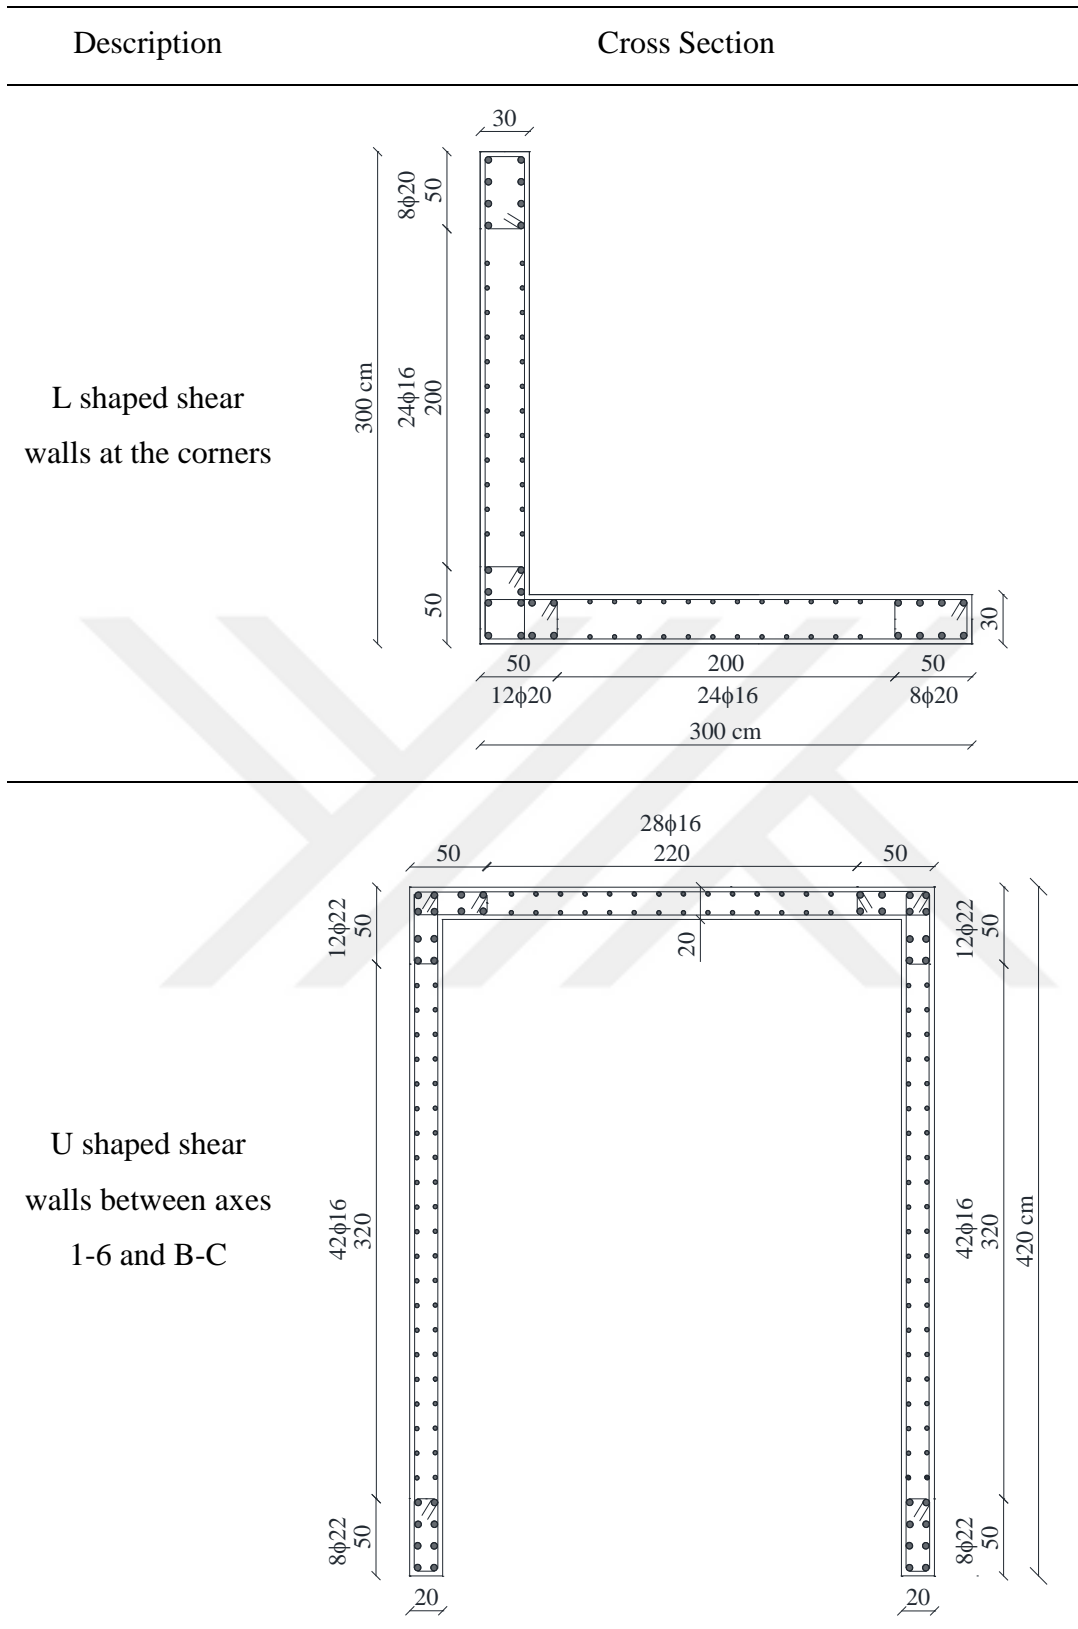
Cross sections and reinforcement details of the shear walls.
